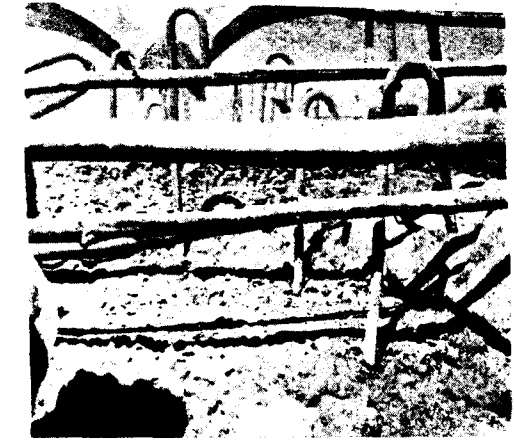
Concreting in the foundation of Bangalore side pier with dowel bars fixed in foundation rock
